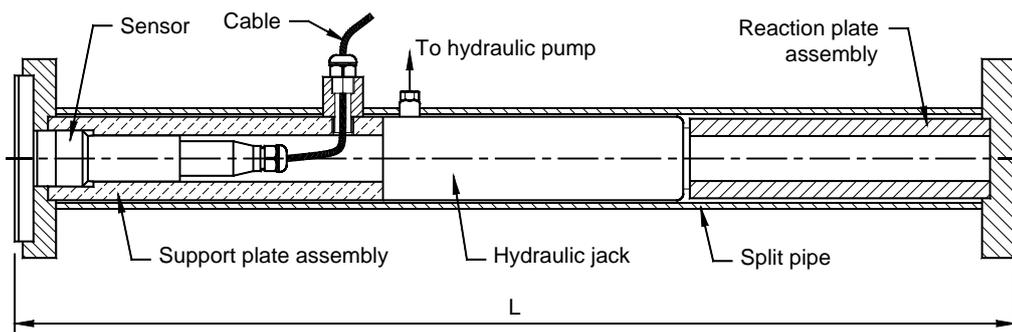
typical assembly of jack out pressure cell in a diaphragm wall
